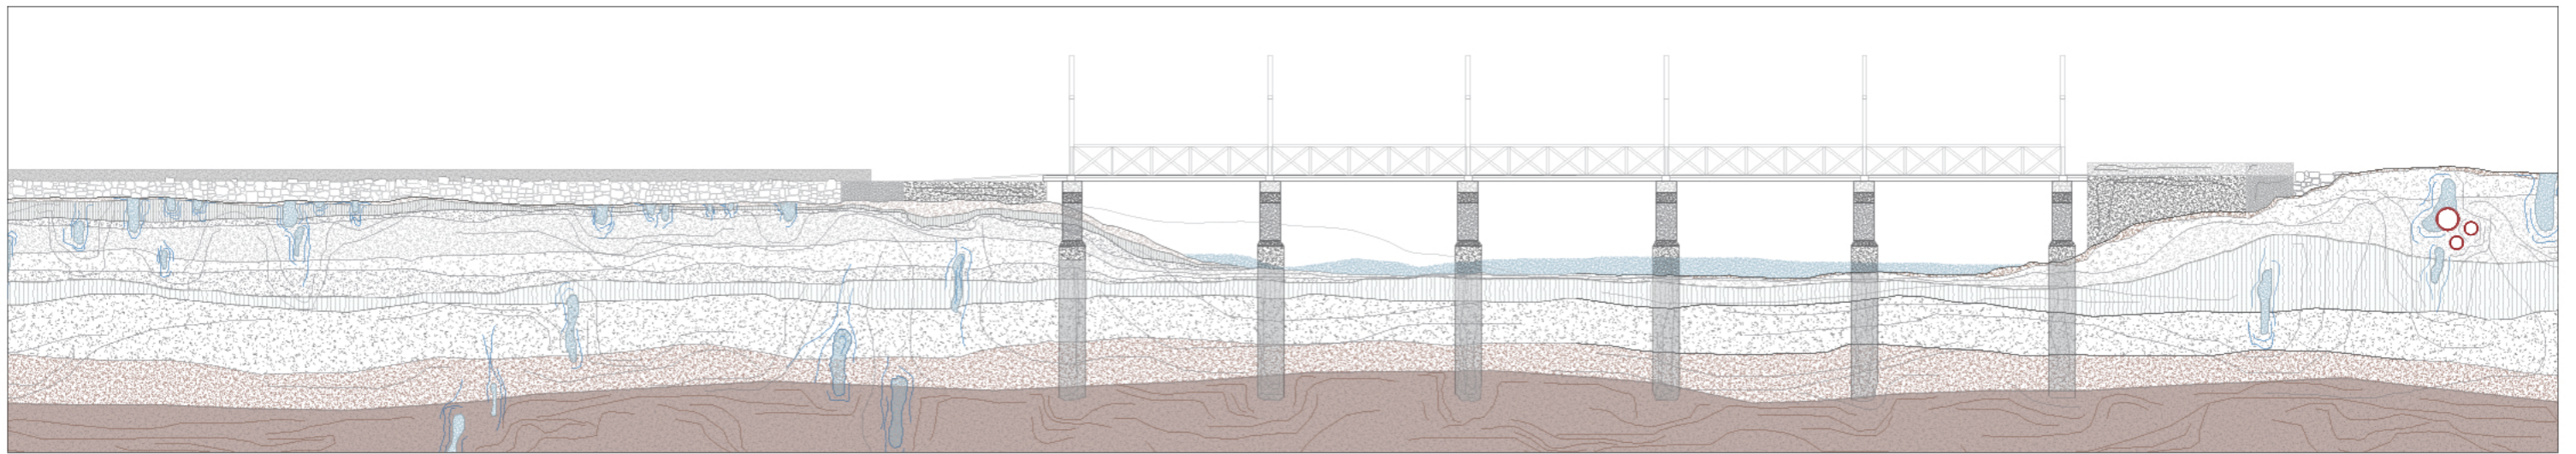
, Author, "Mulranny Causeway and Bridge Elevation", Drawing, 2022
